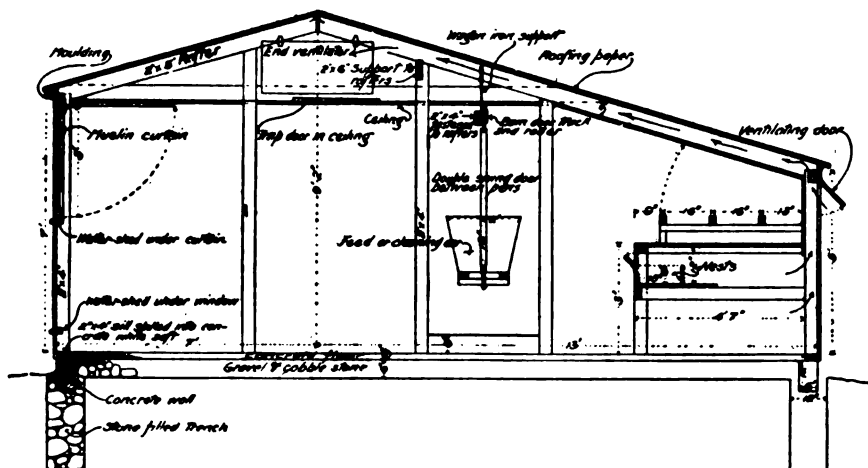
A cross-section plan of a Cornell poultry house with pens 20 feet square, adapted to the combination roof type of construction and interior ceiling
